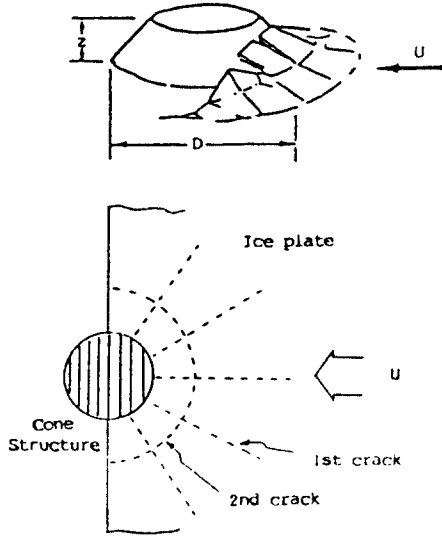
Failure model of ice sheet colliding at cone shaped structures
